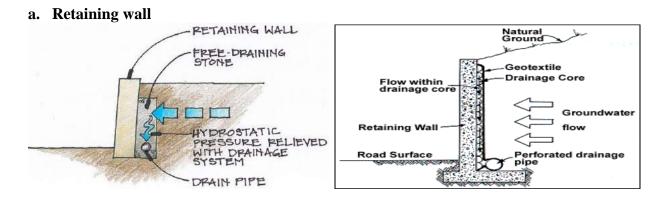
Typical sectiond of retaining walls suitable for stabilisation of lateritic railway cutting prone to soil piping (Panjami 2016)
